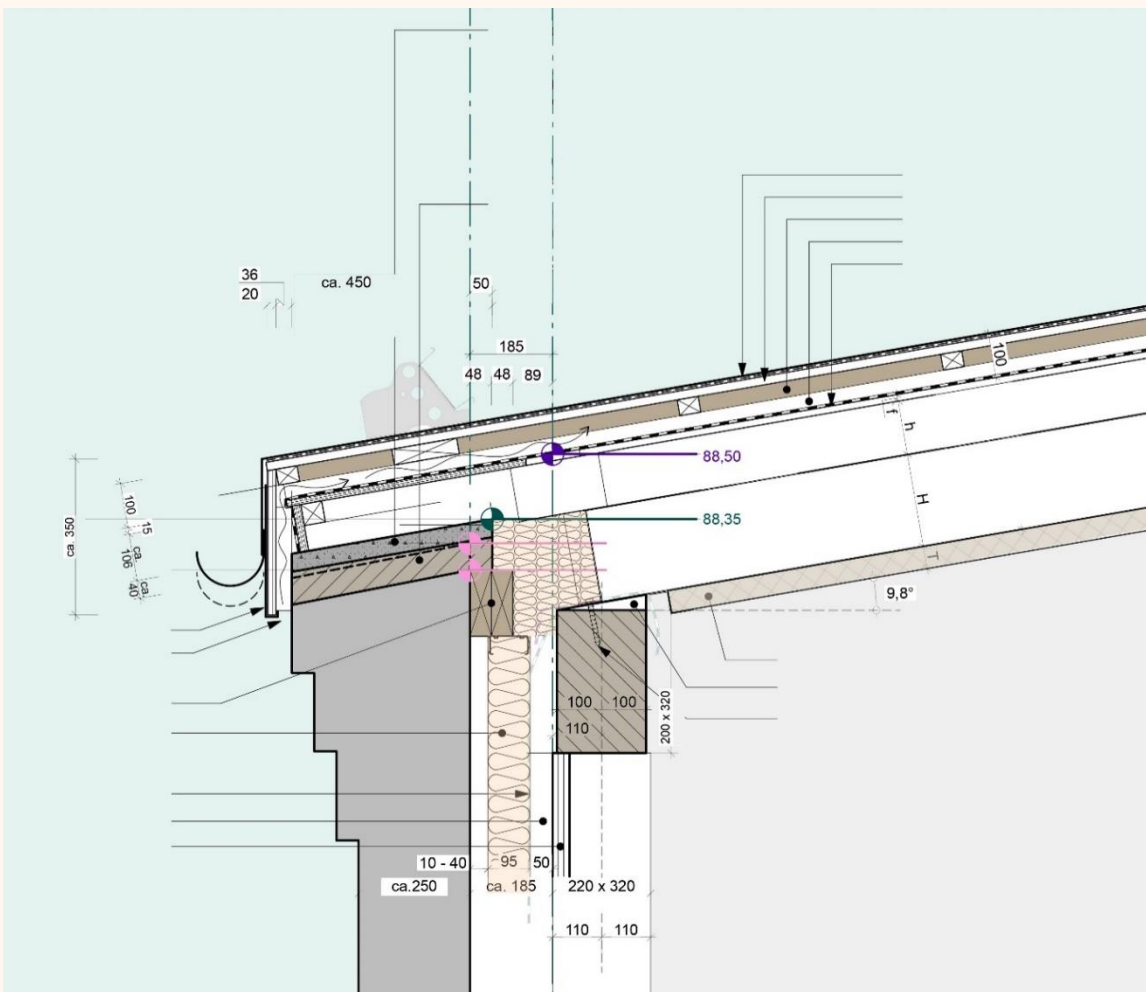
Detail of the H-building wall-roof connection. The technical solutions of the installation of the new roof, the connection between the new roof and the existing façade, and the new added internal insulation layer are shown. Original image by KONTUR and SPINN Arkitekter, edited by Jesus Daniel Garcia Melo (NTNU).
